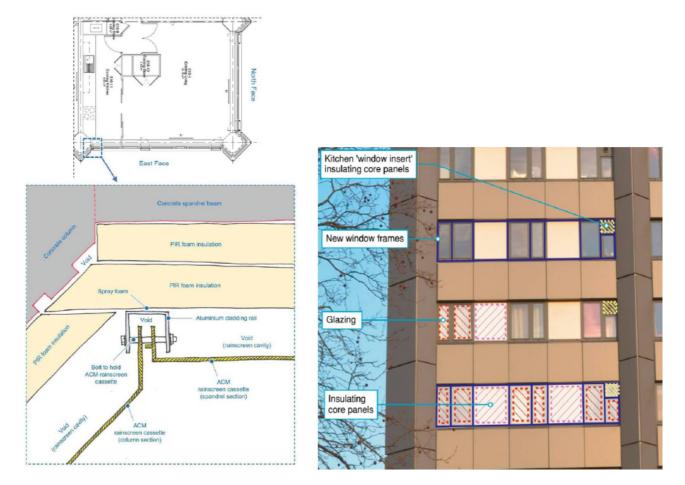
Grenfell tower cladding and insulation system arrangement (images from Grenfell Tower Inquiry Phase 1 report^[62])
